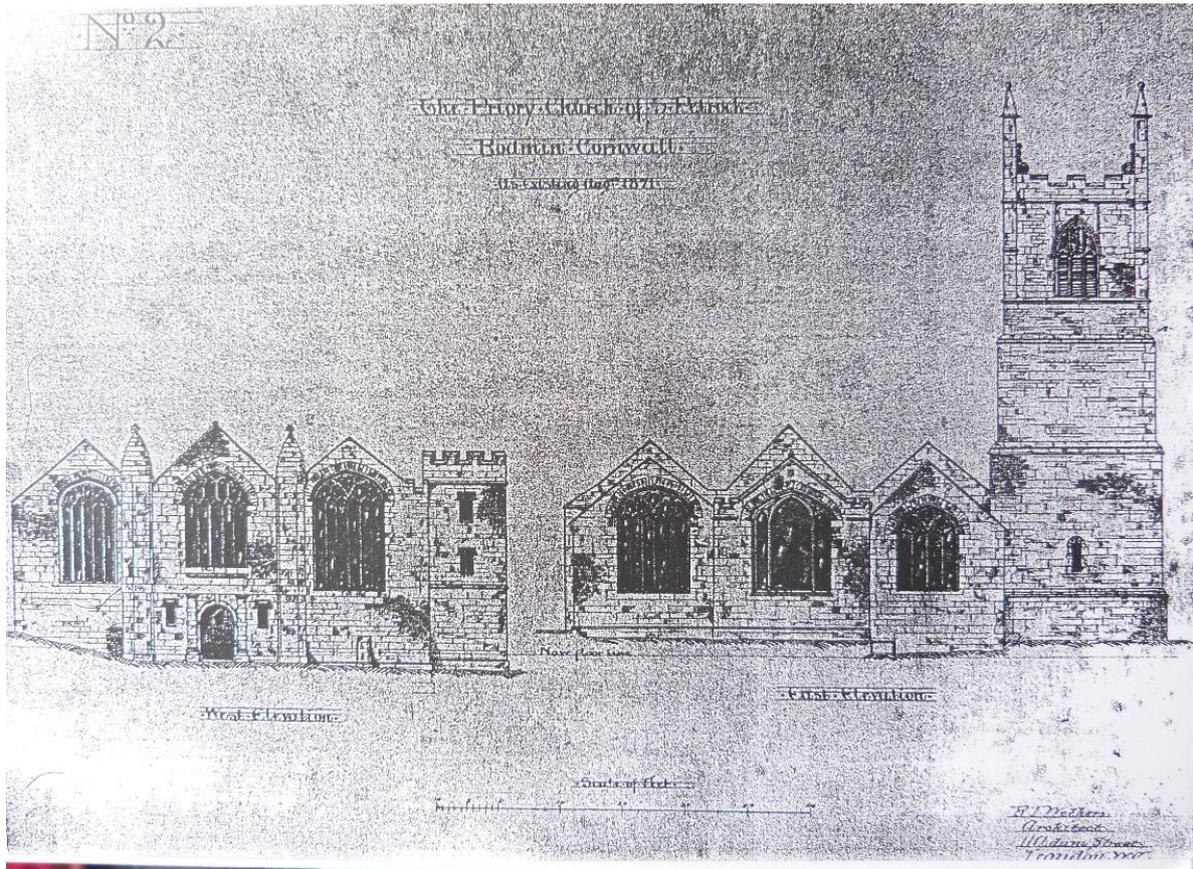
The Priory Church of St Petrock, Bodmin, Cornwall. Existing. August 1871, R J Withers, architect. East and West Elevation. For detail of west front see Figure 25.
